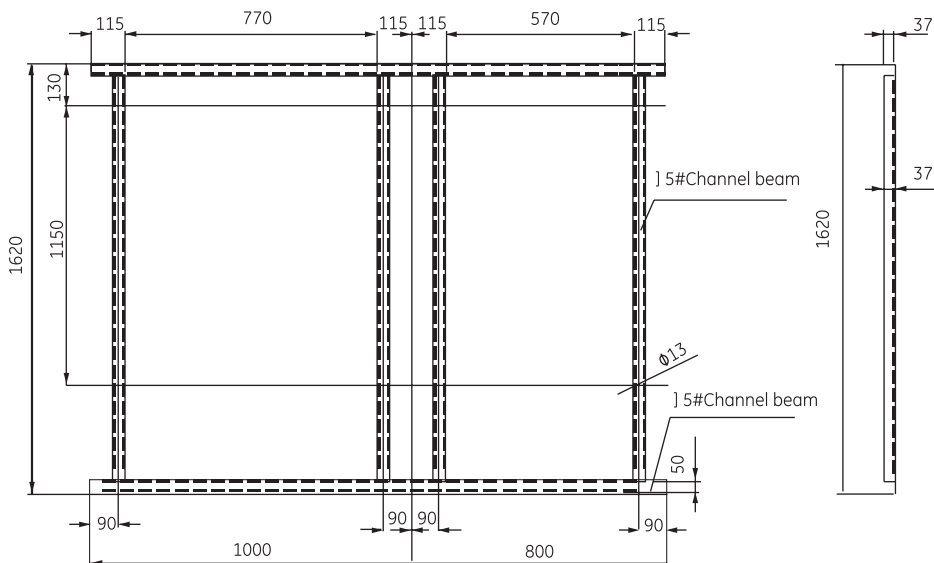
Typical basic frame foundation (for 1000 mm/800 mm width dimension model)
